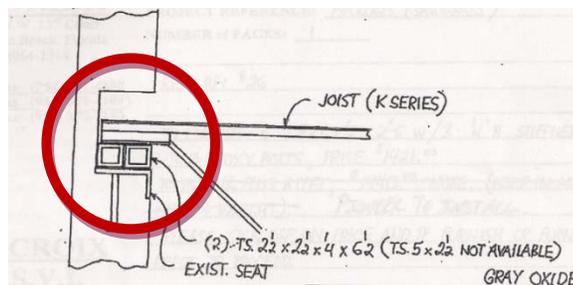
Example of Joist Bearing Embed Adjustment on Project A
